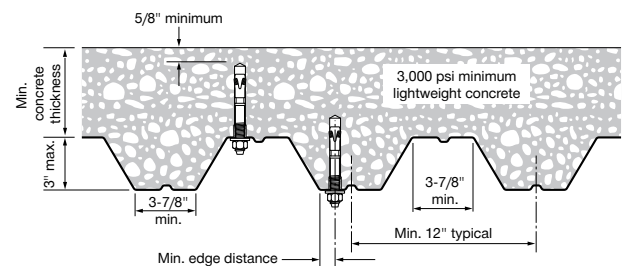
Lightweight Concrete Over Metal Deck Installations
